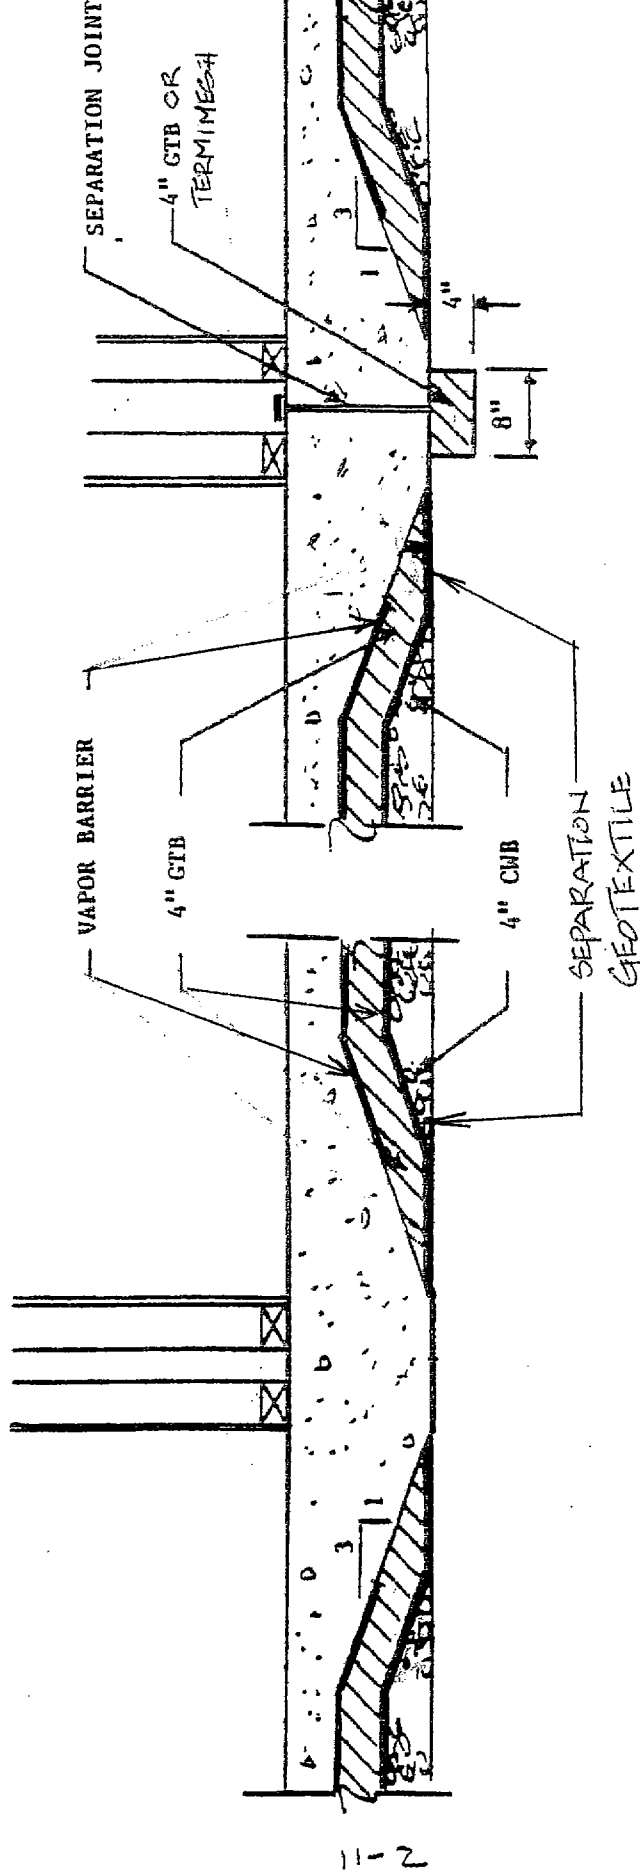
TYPICAL GTB DETAILS AT INTERIOR FOOTINGS
